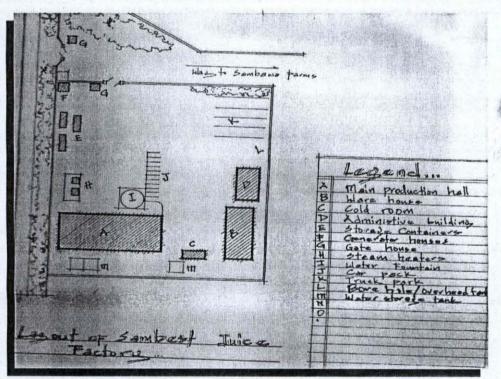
; Sketch of the Layout Source; Author's Fieldwork, 2008
